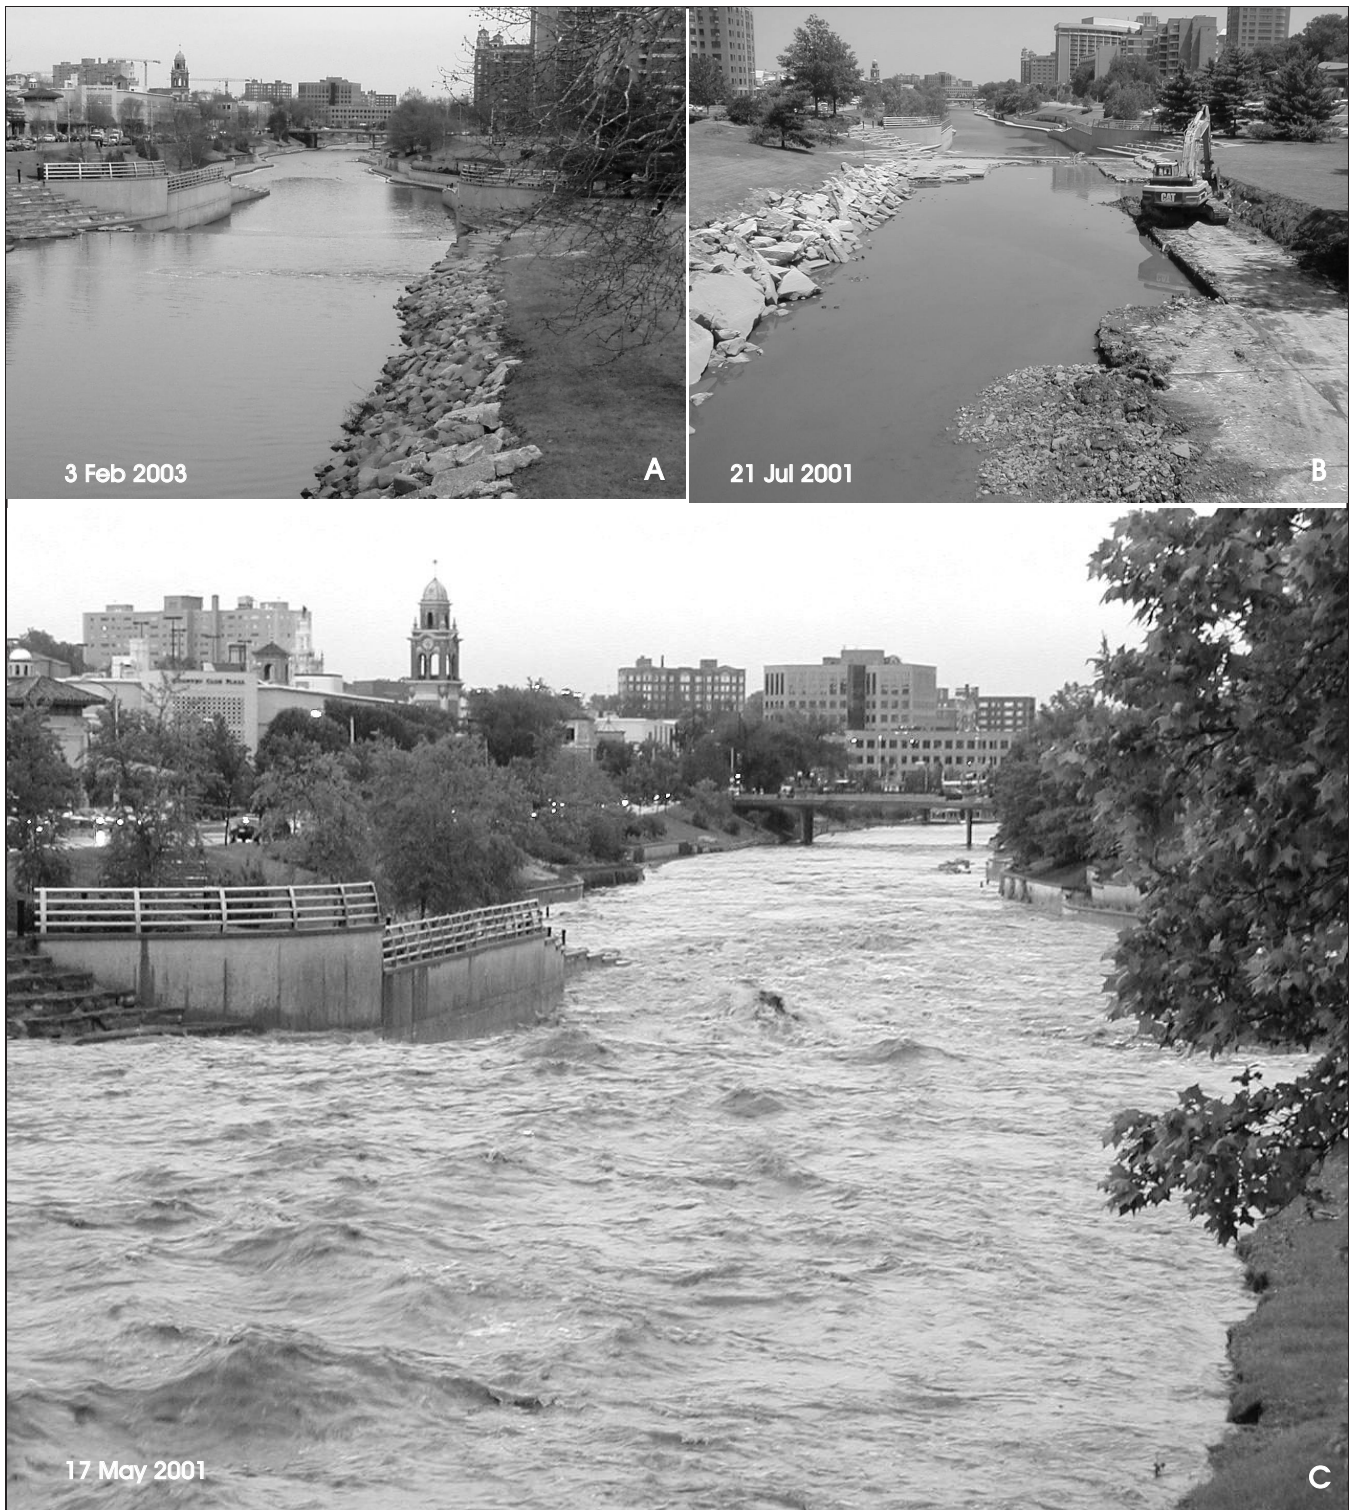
Brush Creek and Country Club Plaza, viewed toward the east from Roanoke Parkway Bridge. A. on a dry day after a prolonged drought in February 2003. B. During July 2001 when the channel was stripped of a concrete liner and deepened by about 2 m to facilitate flow and lessen the impact of rain events and flooding. C. After rainfall of several inches on 17 May 2001. The tower visible in the distance in all three photographs is located at the starting point of the trip.
